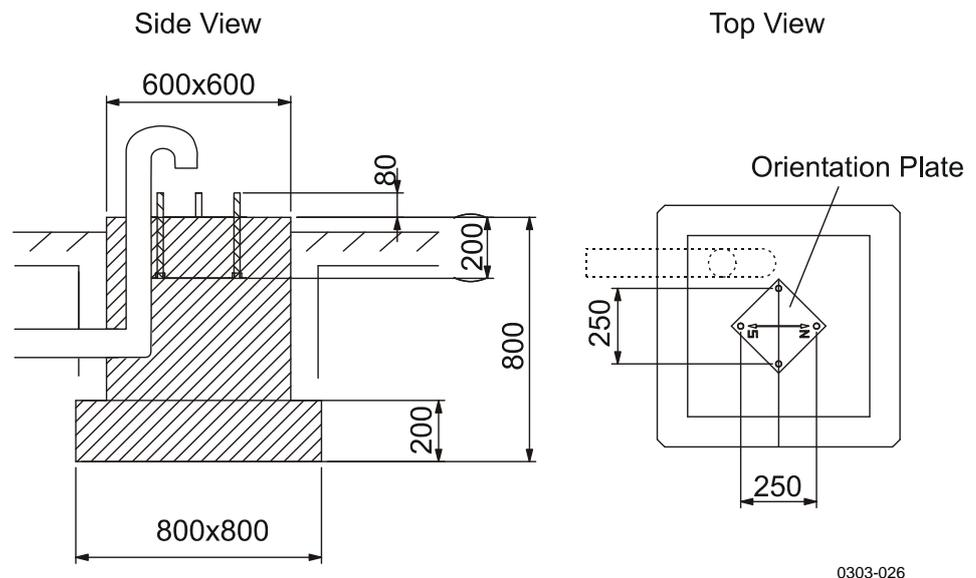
Main Mast Block and Orientation Plate (Dimensions in mm)
